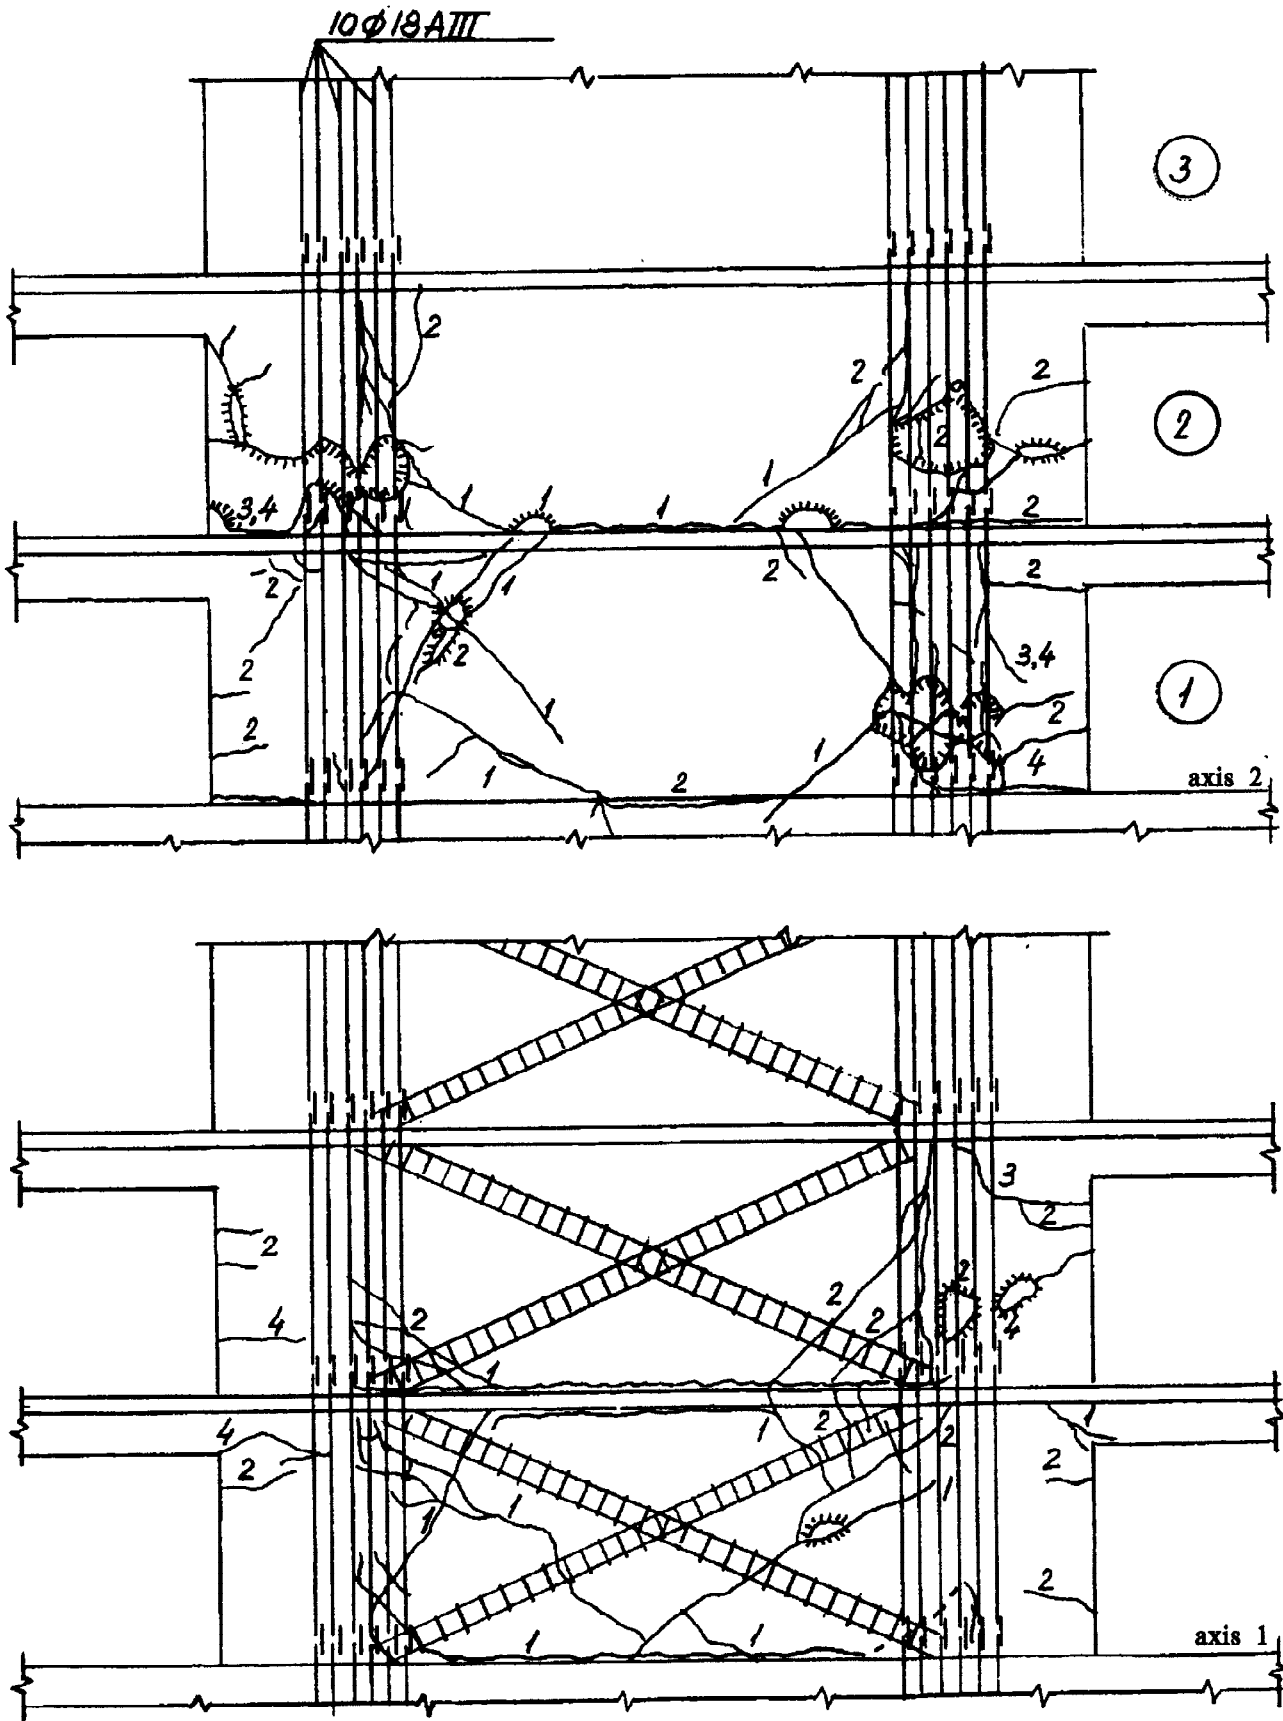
Patterns of cracking in the walls of the building section N1 (ground floor, first and second storeys)
